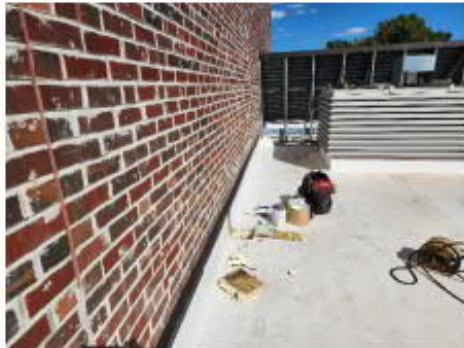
S-SE Low Roof with Metal Screen Wall (Roof 8)
